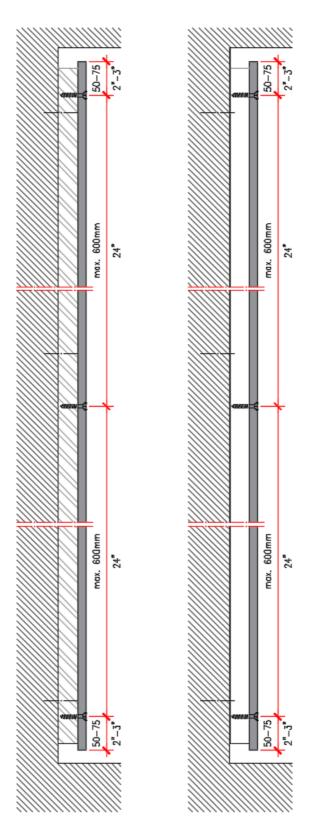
Vertical section Wooden structure and galvanized steel
